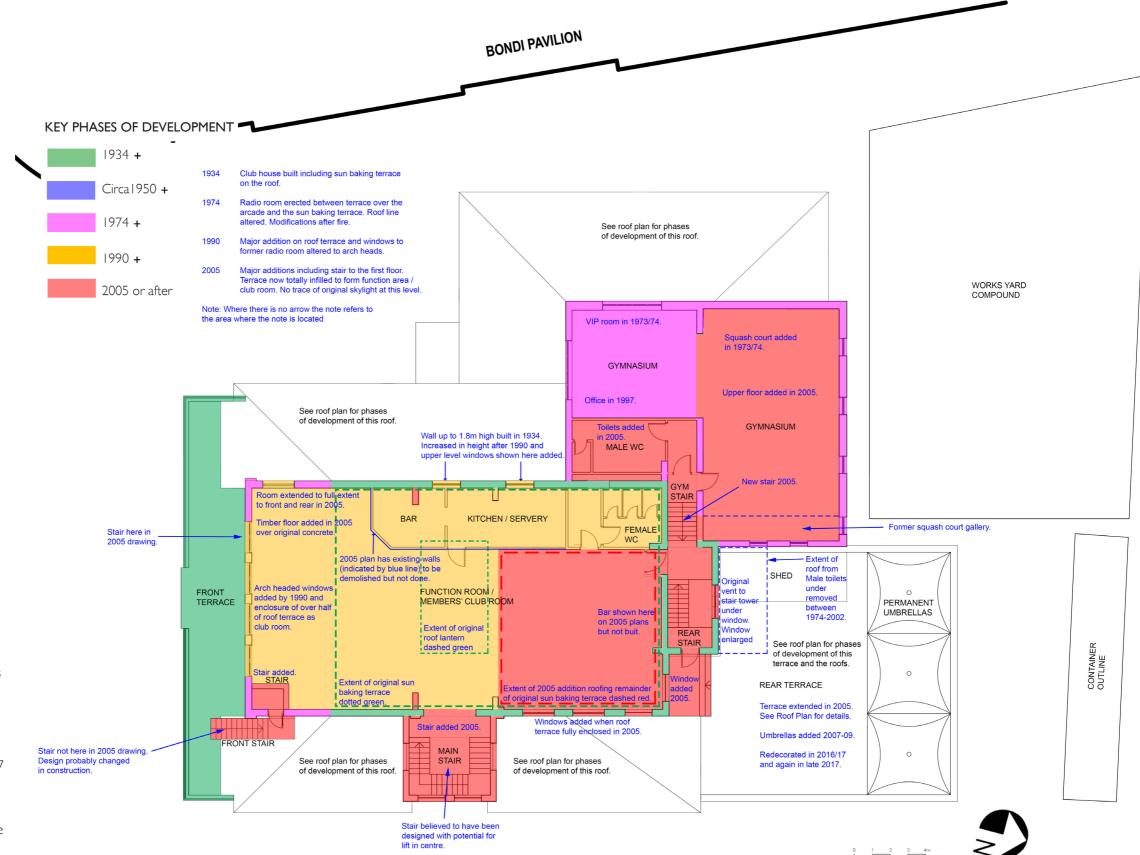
FIRST FLOOR PLAN PHASES OF DEVELOPMENT
